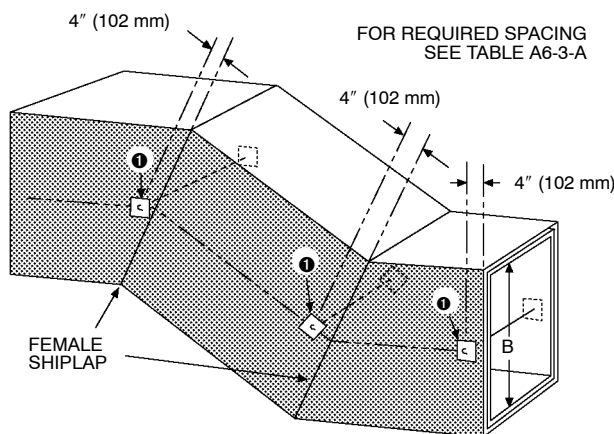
OFFSET REINFORCEMENT CHEEK PANELS WITH SHIPLAP JOINTS
